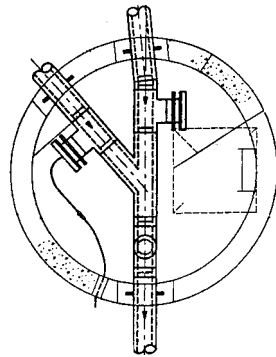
A plan view of a manhole detail whereby the piping components housed within feature continuous double containment.
